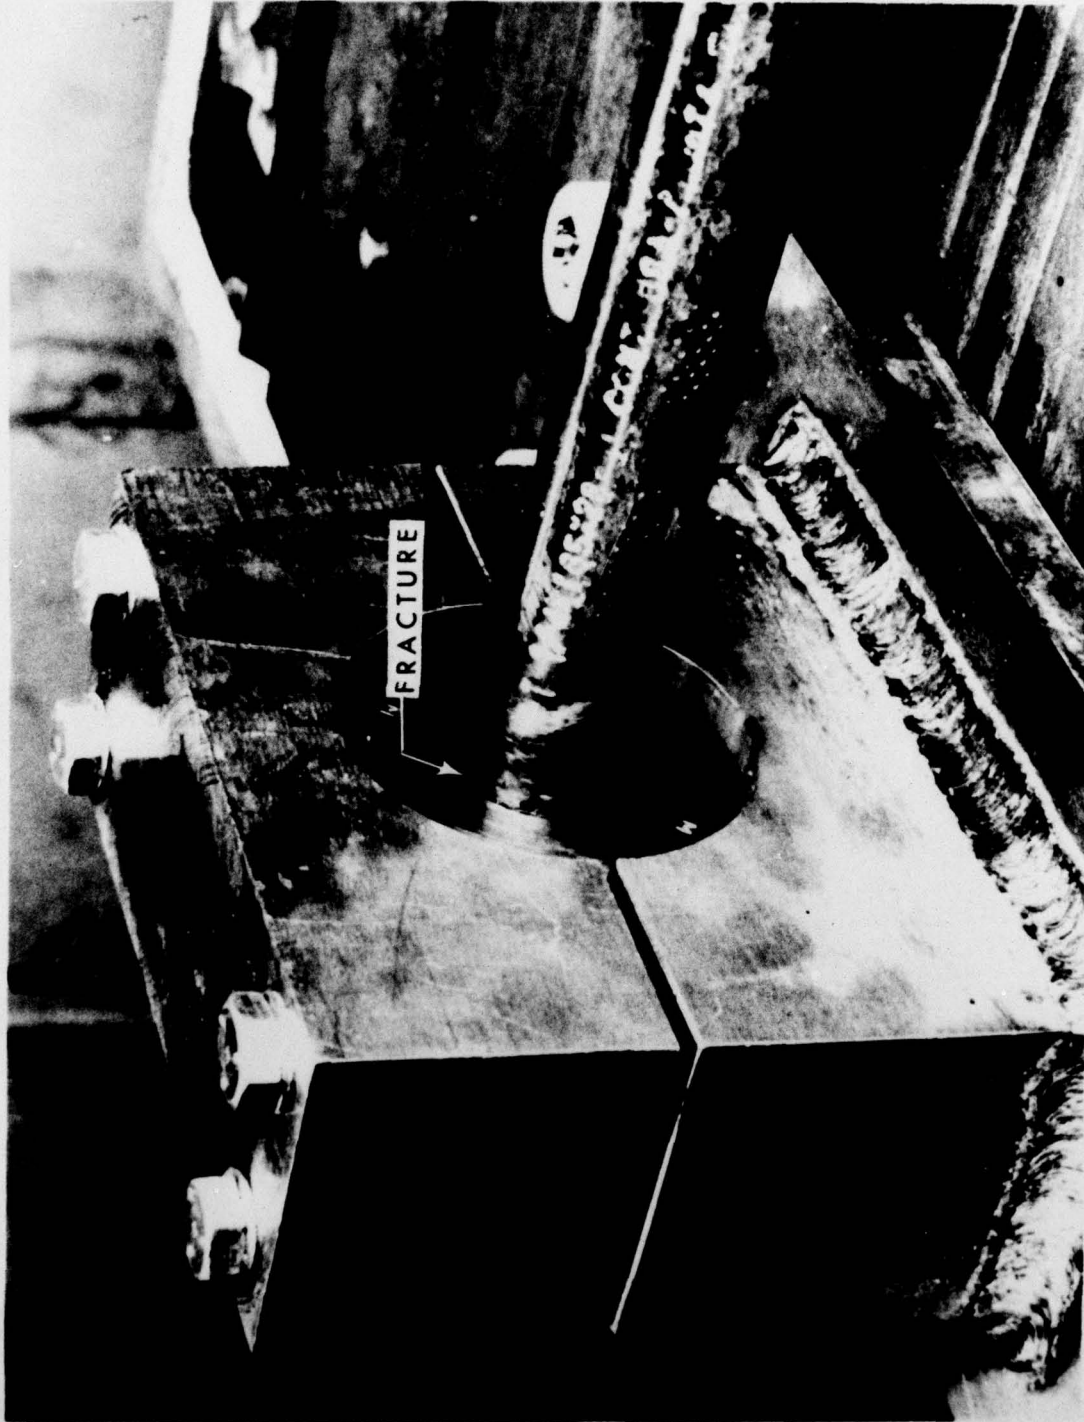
Failed Bending Fatigue Specimen in Test Rig
